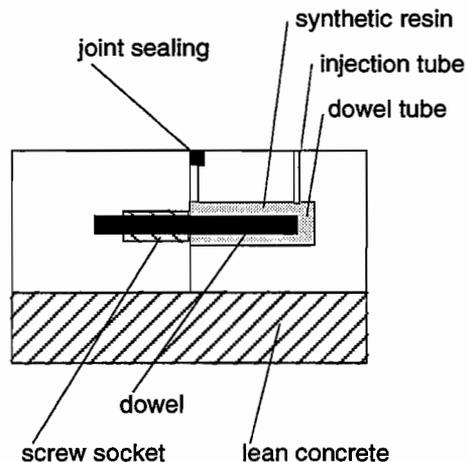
Transverse joint construction in prefabricated portland cement concrete slab
